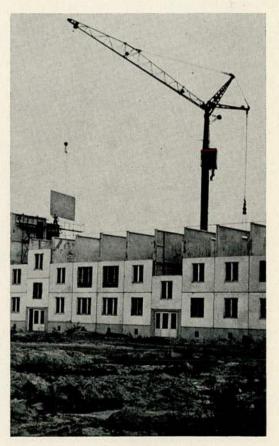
Apartment building construction, Moscow. Precast units being placed by tower crane.
